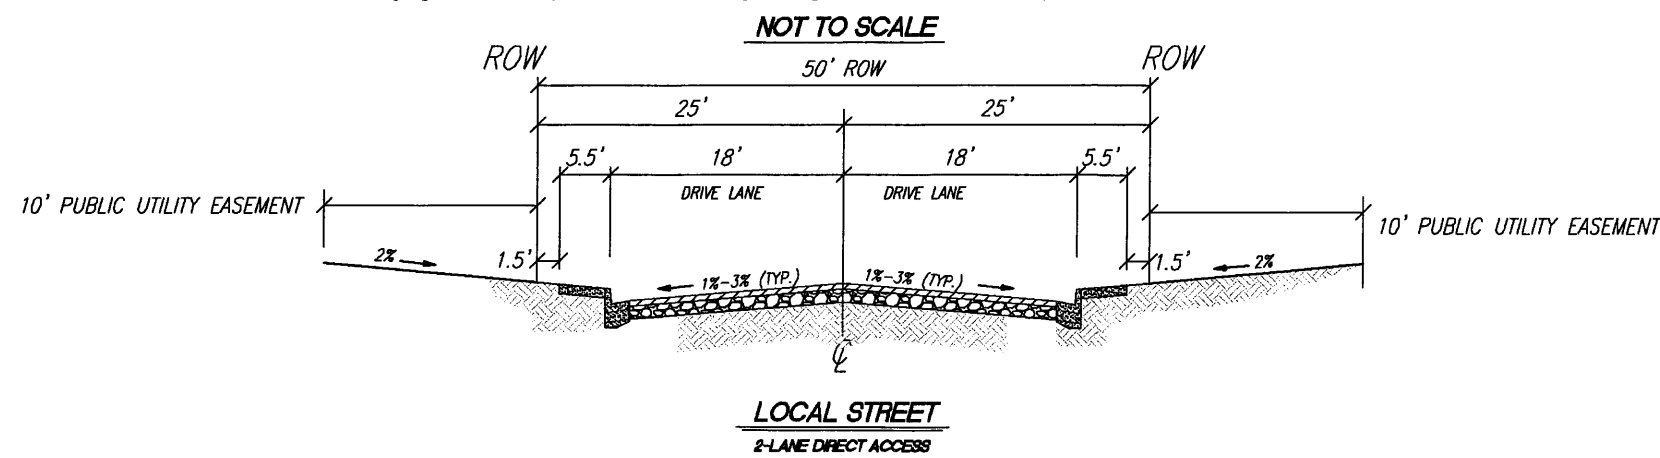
JANICE AVENUE CROSS-SECTION
